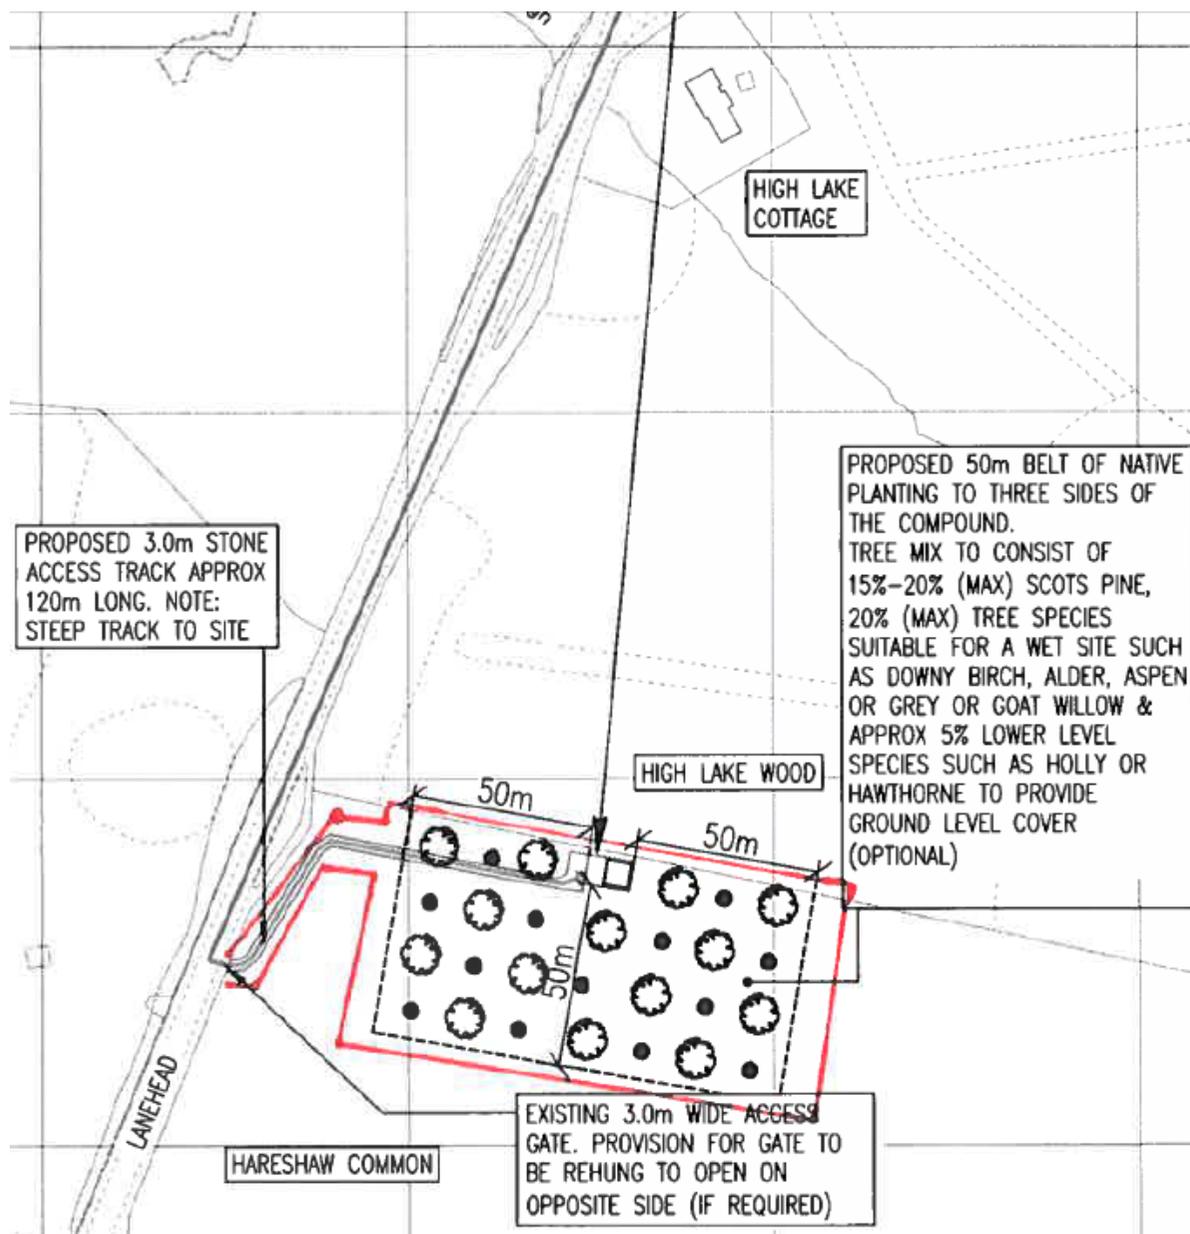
Extract from proposed location plan showing site layout including landscaping
